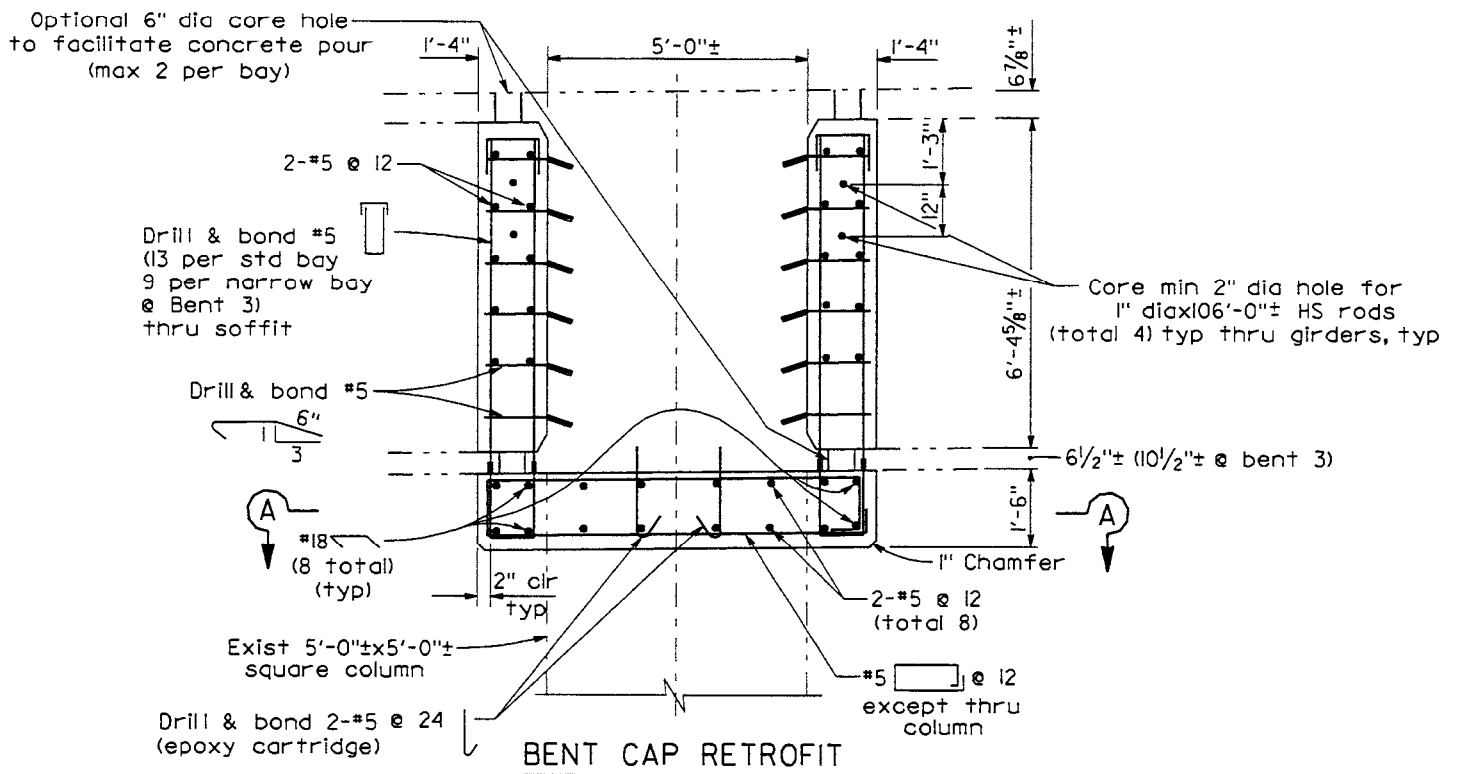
Concrete Box Girder Bent Cap Strengthening
